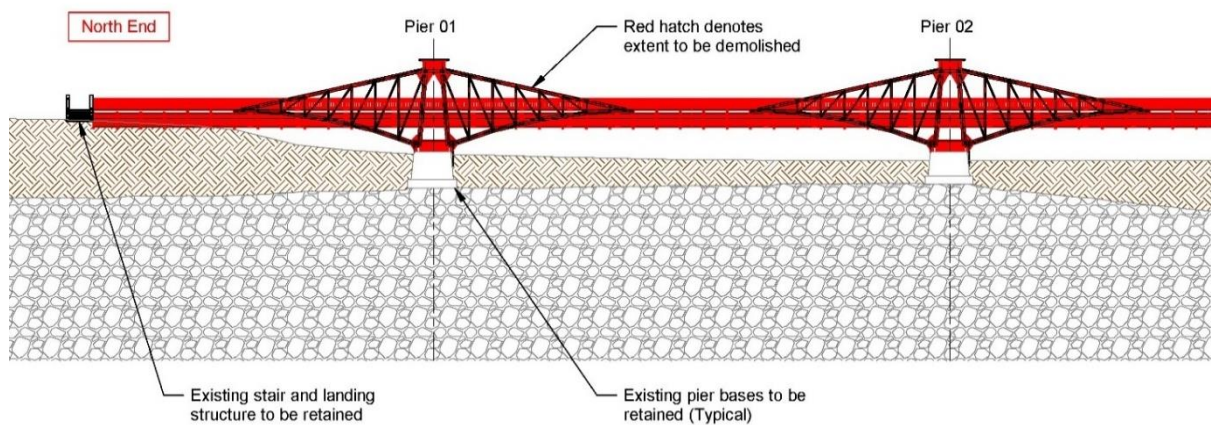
Detail of Long Section at Piers 01 and Pier 02, showing proposed demolition of Aqueduct superstructures with retention of footprint elements (North Stair Landing and Pier Bases)
